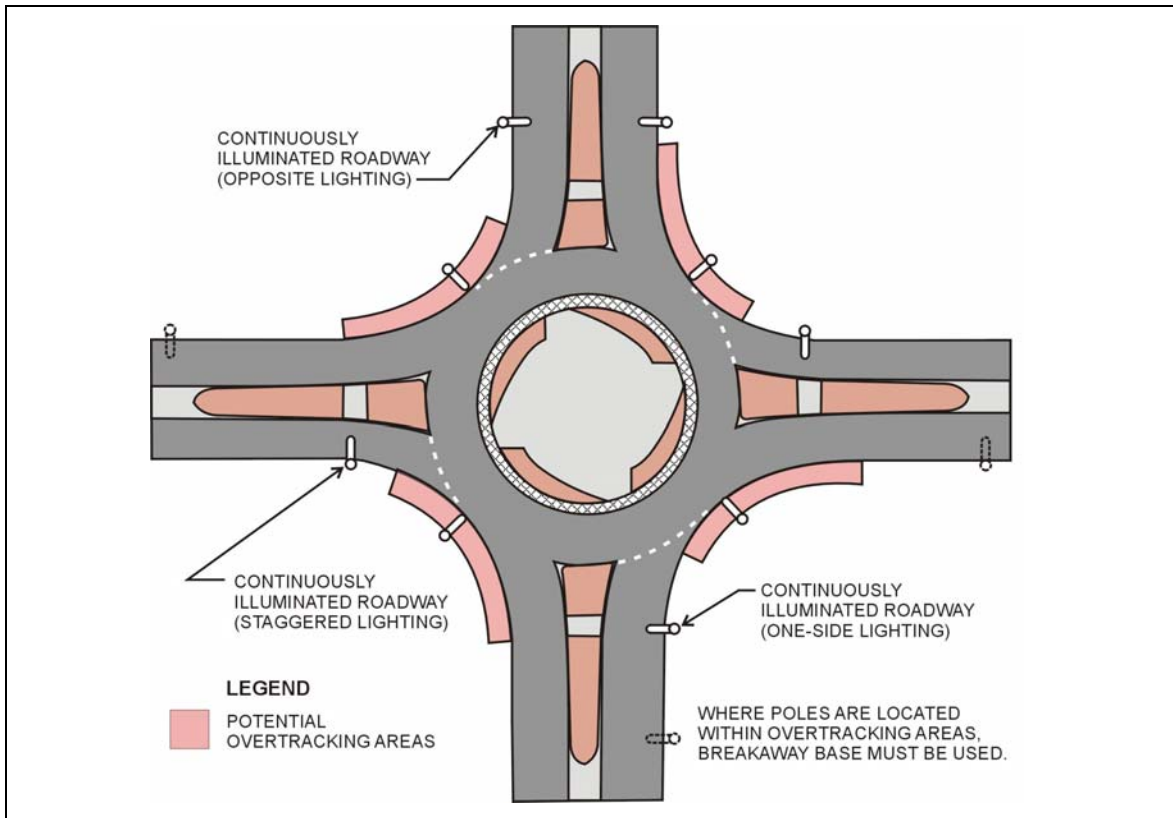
Example of Full Lighting on a Roundabout on Continuously Lit Roadways
